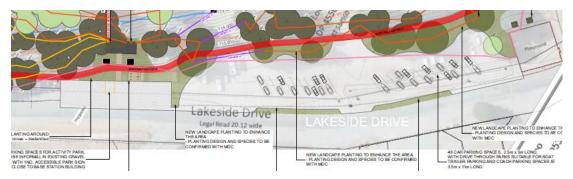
A indicative parking layout and landscape plan for the carpark that adjoins the site.
